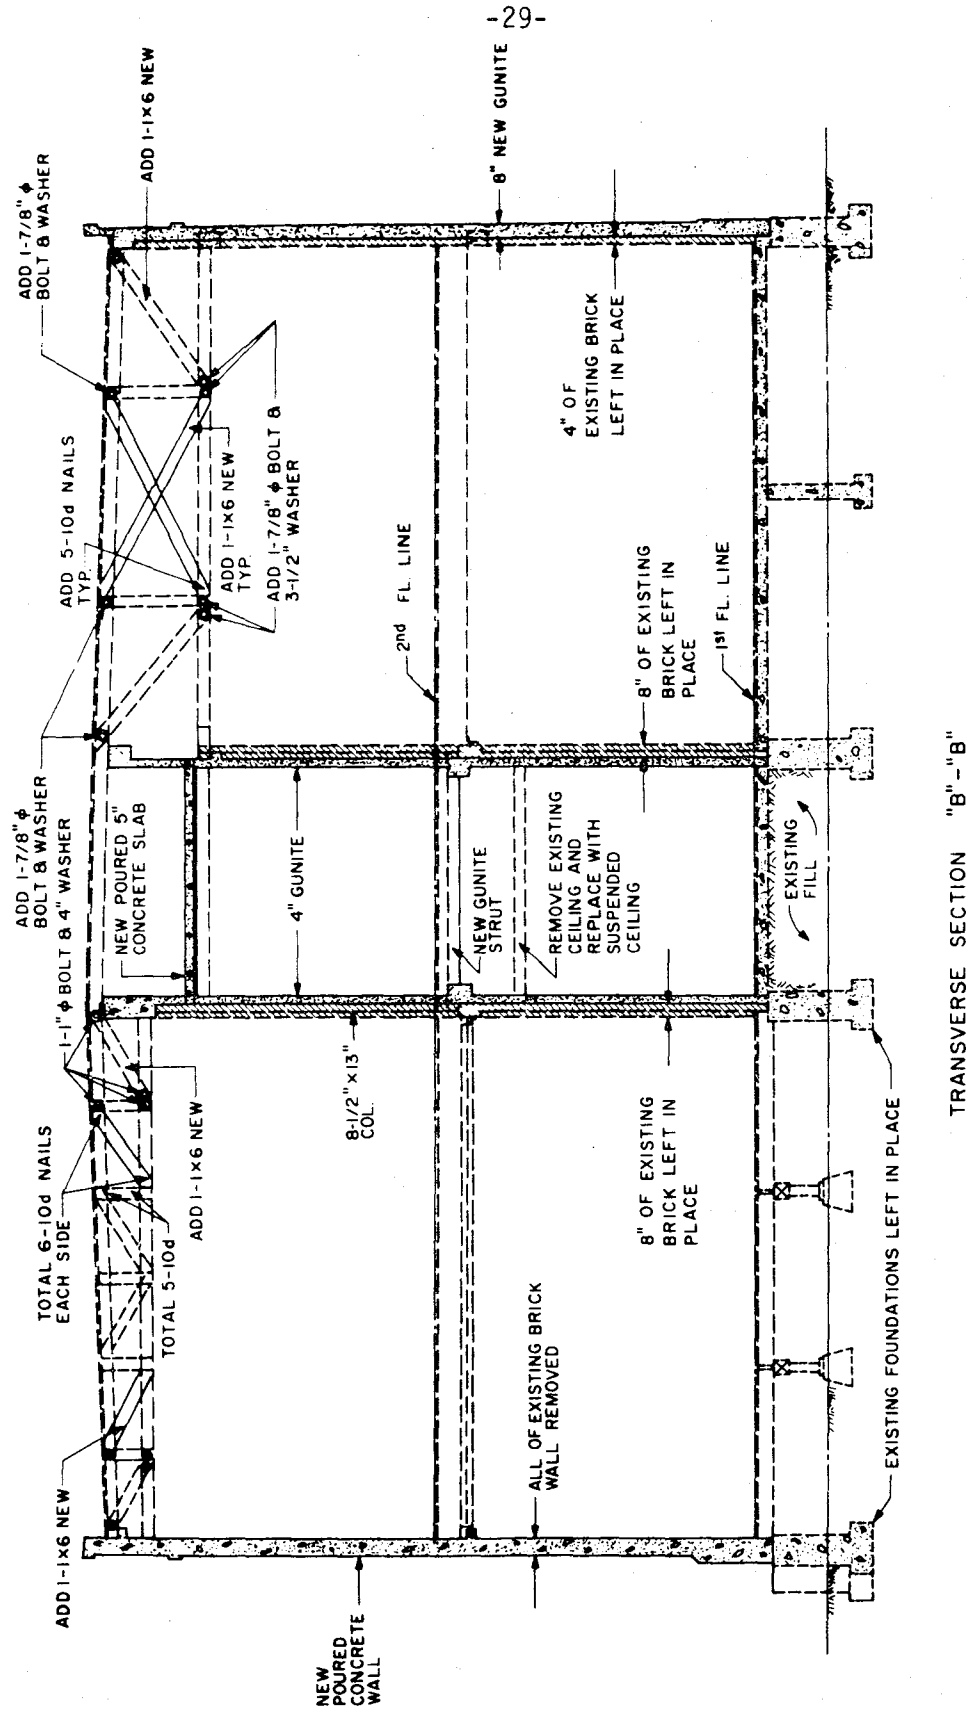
Cross section of the South Building showing details used to strengthen the structural framing.
